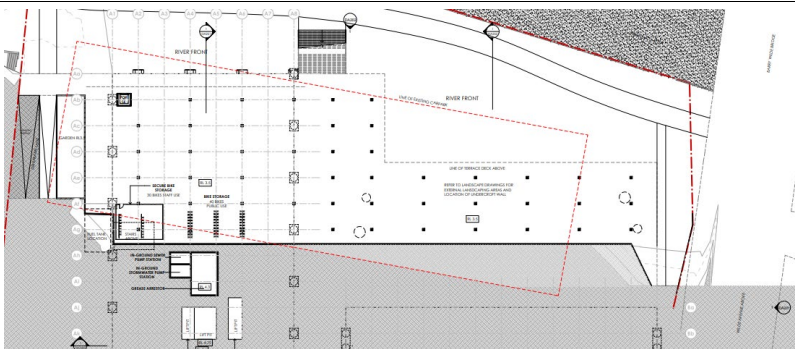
Lower ground floor undercroft space fronting Parramatta River
